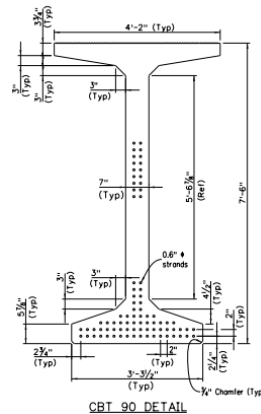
Typical section of a CDOT CBT girder (CDOT Standard Details)
